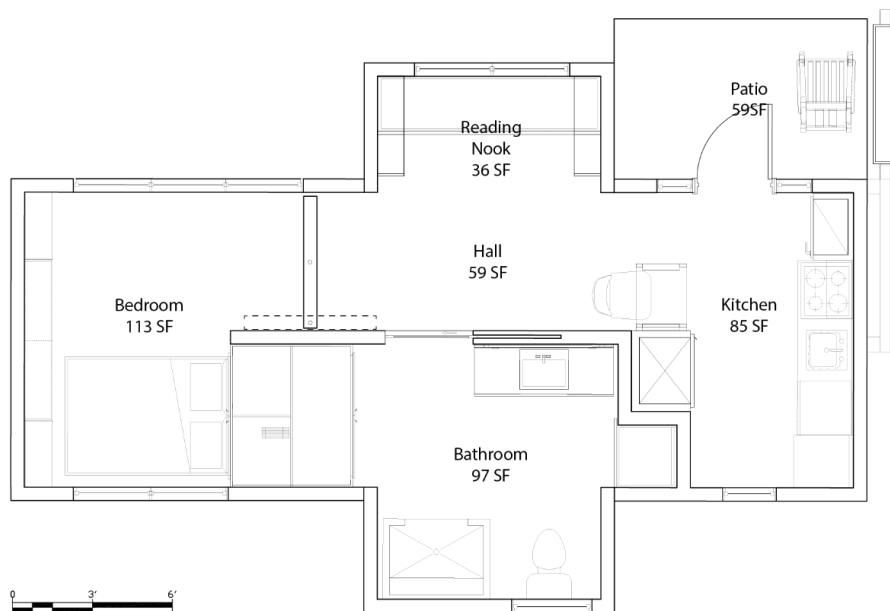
Floorplan of Proposed Additional Dwelling Unit
